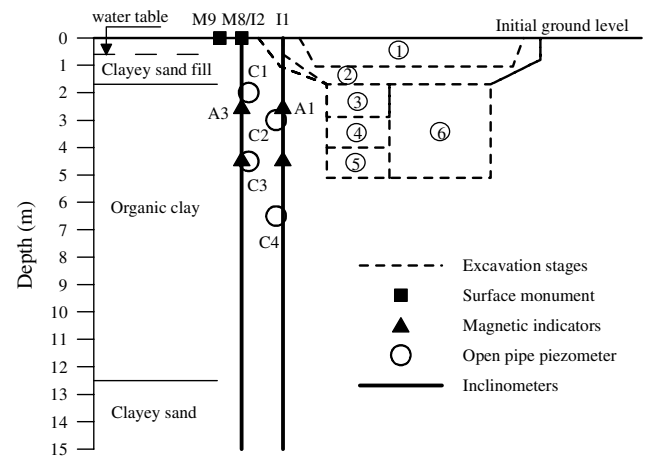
Geotechnical profile, excavation geometry, and instrumentation
